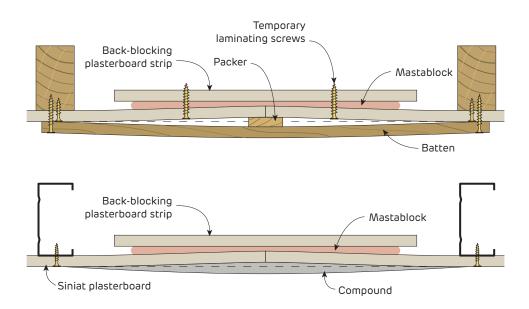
Creating a Recess on a Wall Butt Joint using a Temporary Packer Plan
